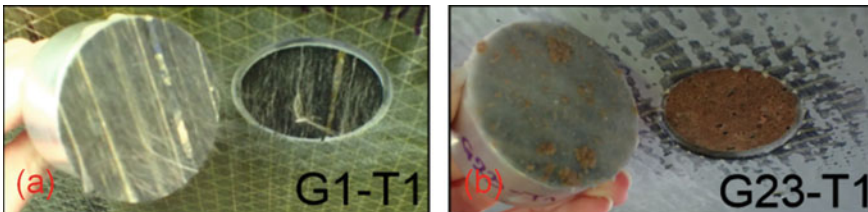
Two failure modes were observed: a Mode B on girder 1, b Mode E on girder 23
